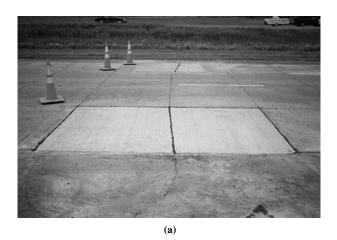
and 8 show examples of typical repairs performed on the ultrathin whitetopping sections at Mn/ROAD.
